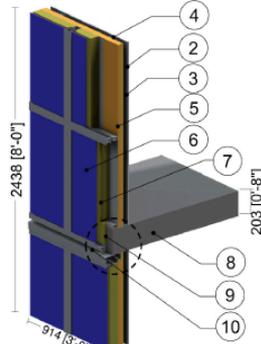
Interior Insulated Concrete Curb – Window-Wall and Intermediate Floor Intersection
